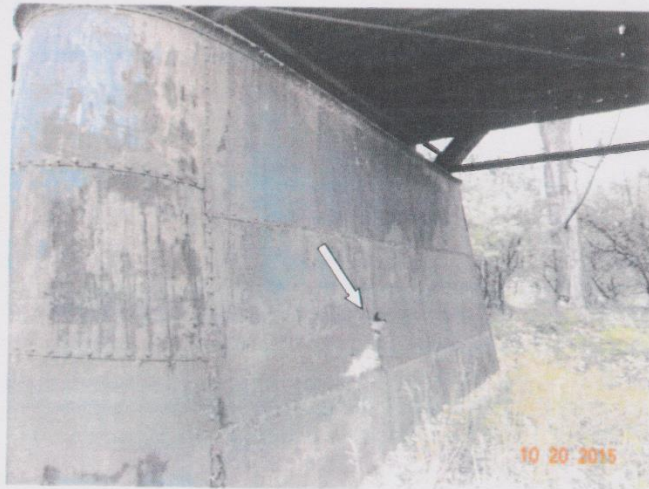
View of corroded steel plate with 6" void in concrete at Bent #4.
